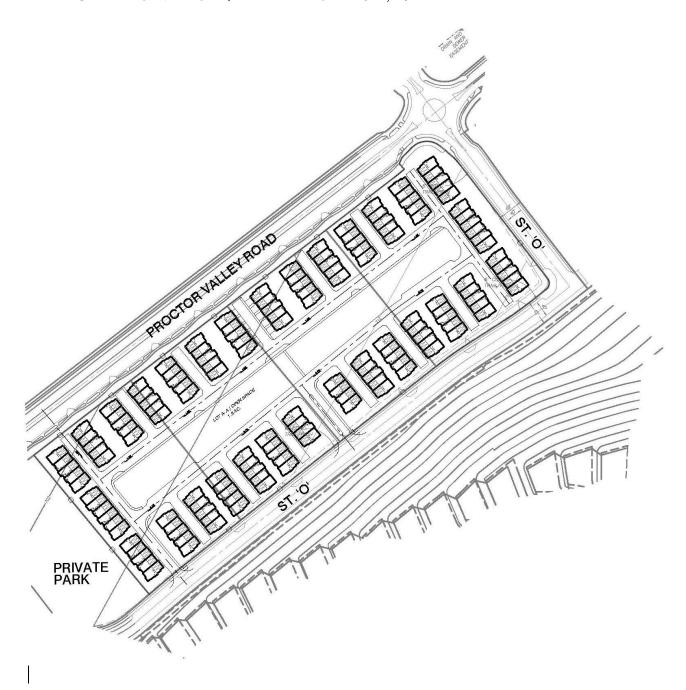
Typical MF <u>DeAt</u>tached Condo<u>minium</u> Conceptual Site Plan
